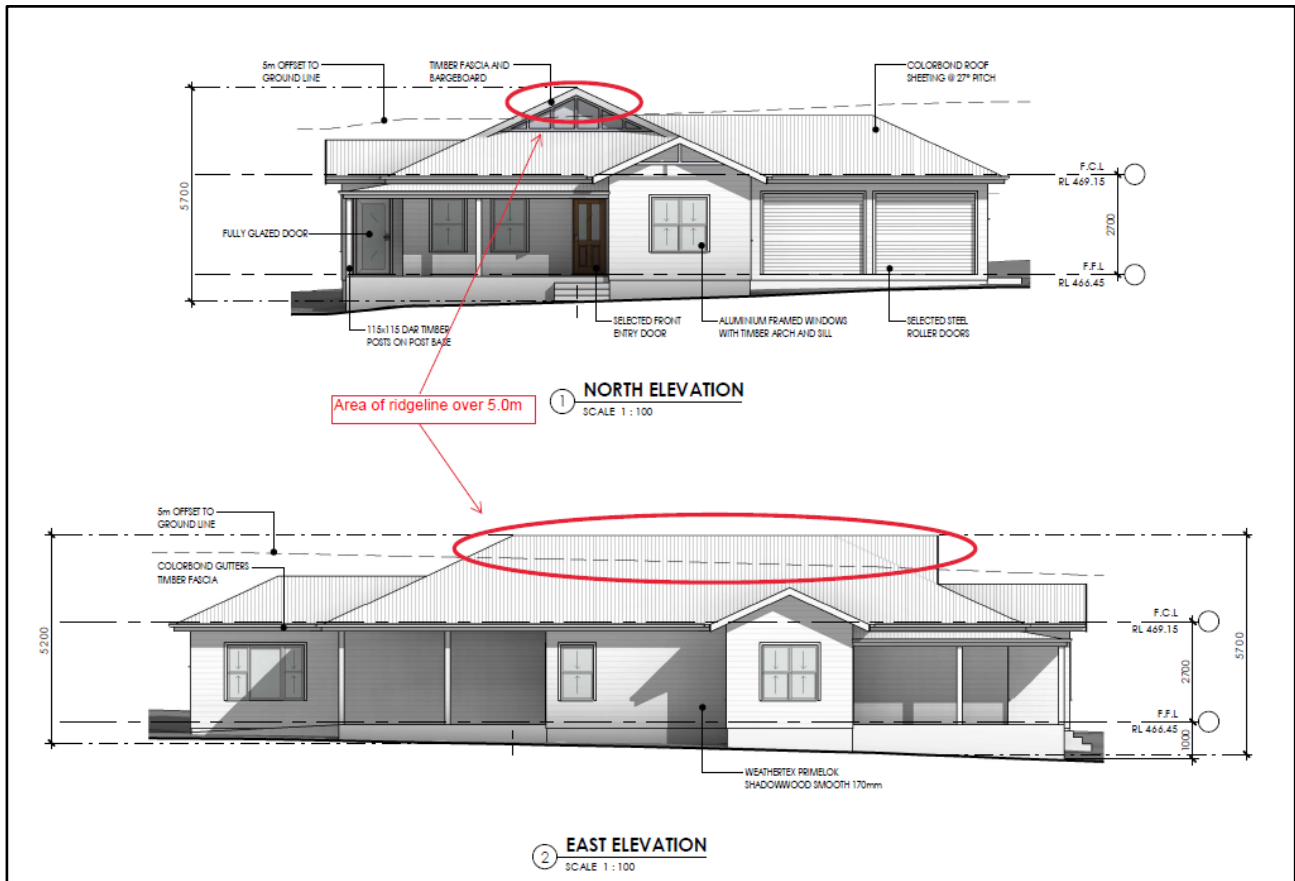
Extract from proposed elevations showing extent of ridgeline over 5.0 metres.
